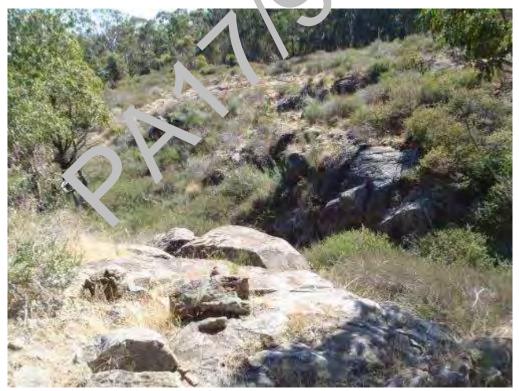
Dam 2 – View of rock expersed at it face on northern abutment
